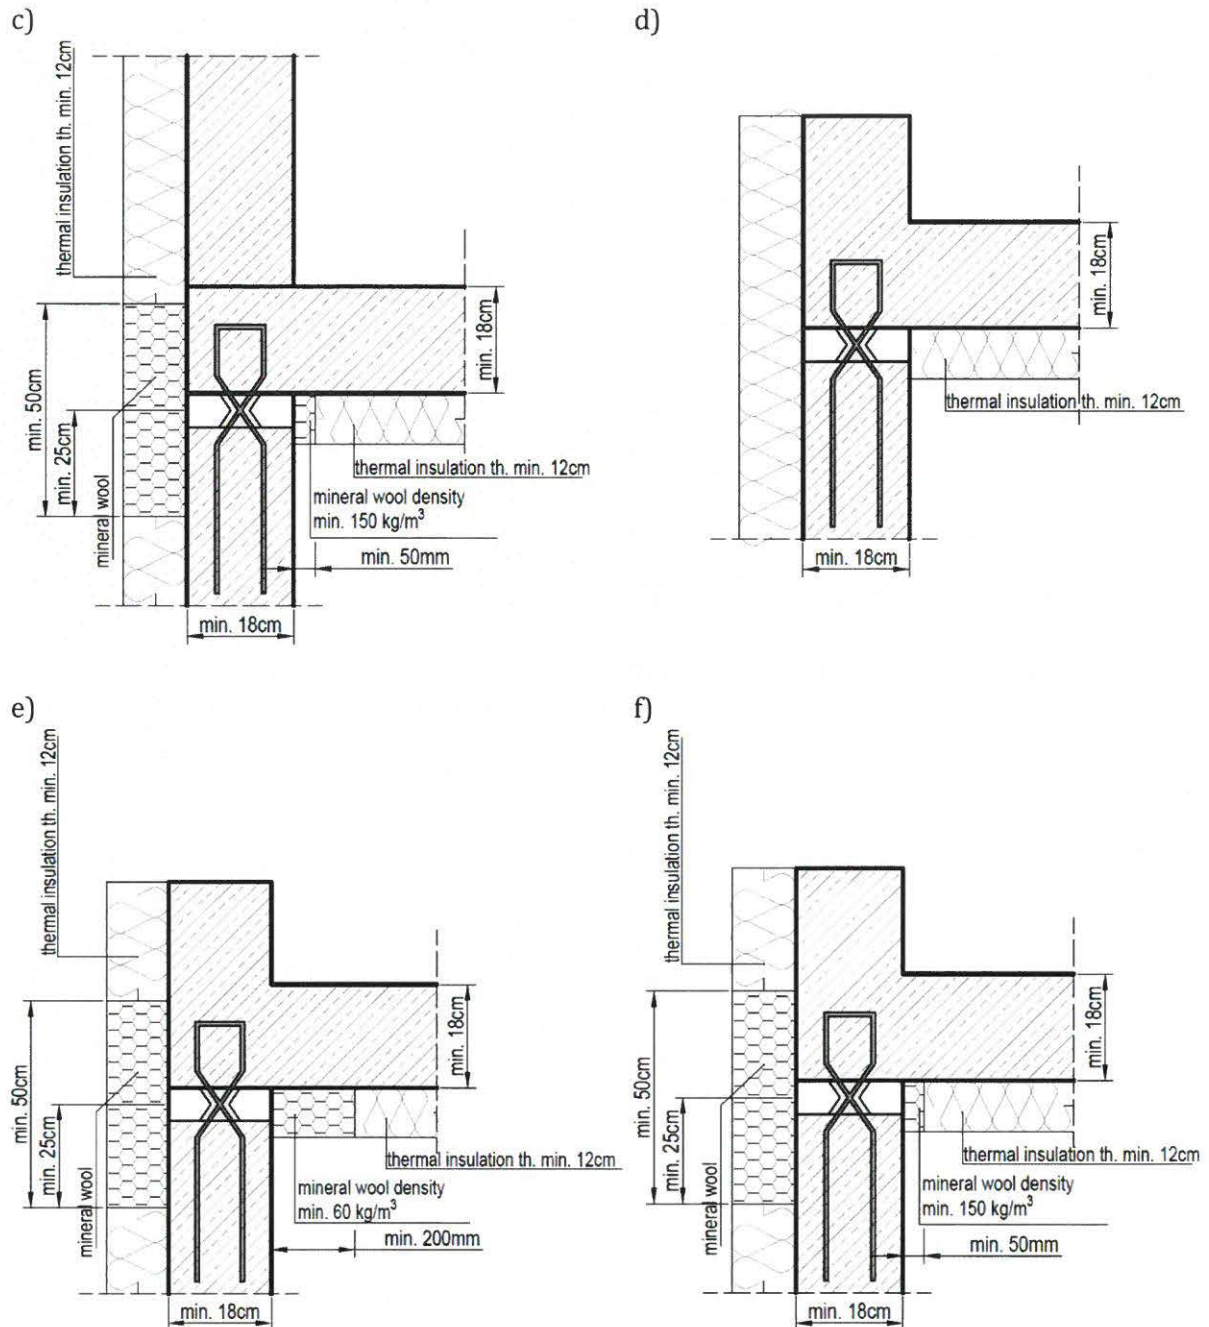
(cont.). External wall and floor/flat roof connection with Schöck Alphadock / Sconnex Typ W
